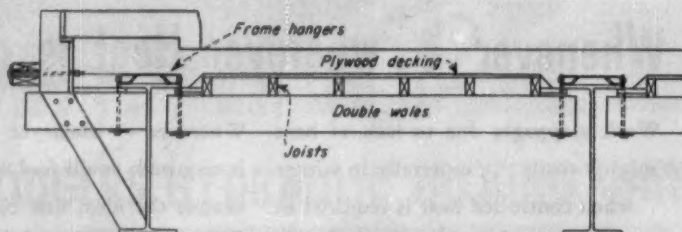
Typical flat slab haunched structural steel beam & slab form
